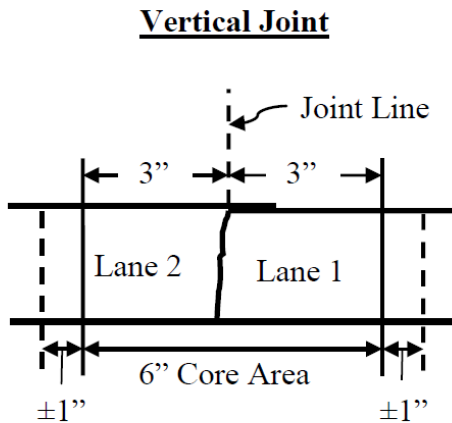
Cross-sectional View, Position of Core Along Longitudinal Joint
